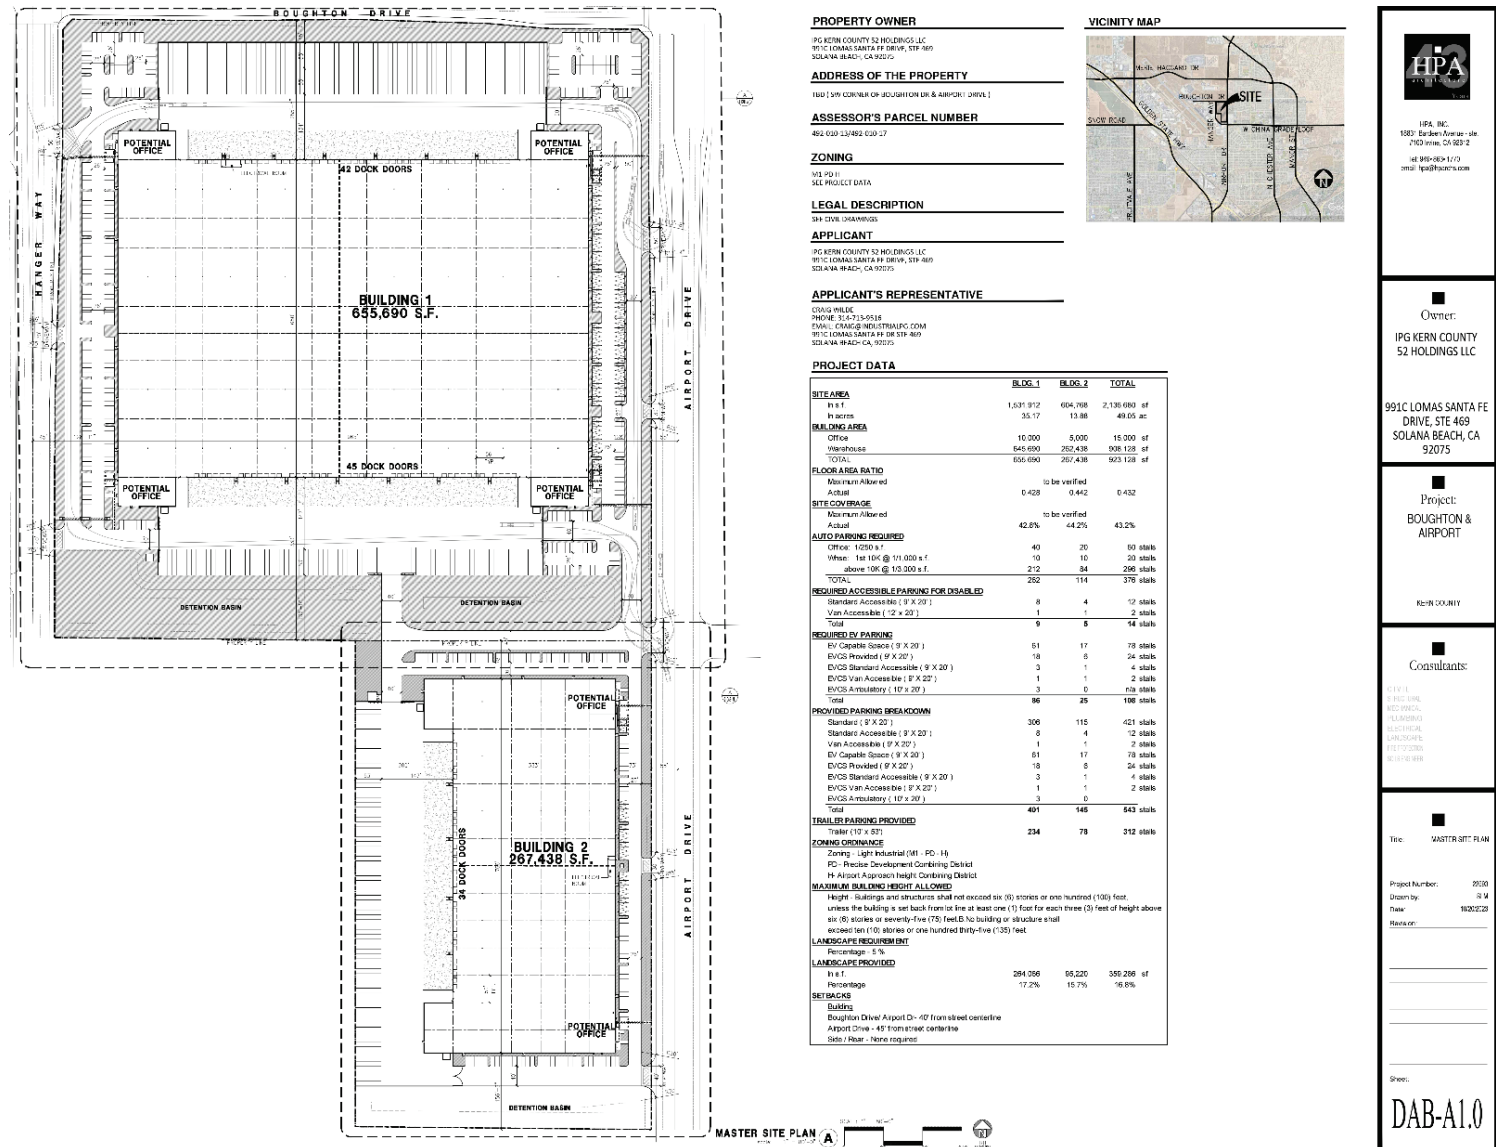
Proposed Precise Development Plan – Overall Site Plan
